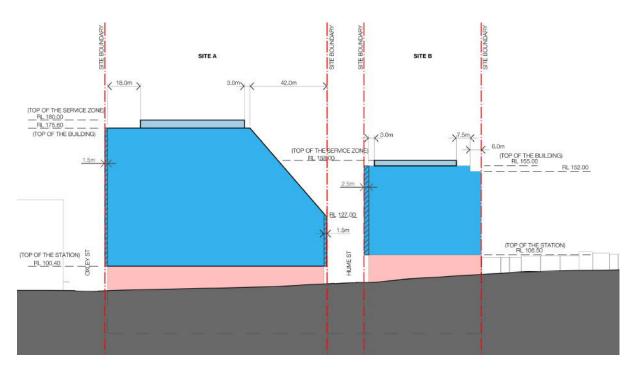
West elevation of the building envelope under the Amended Scheme, showing CSSI Approval (pink) and OSD components (blue)
